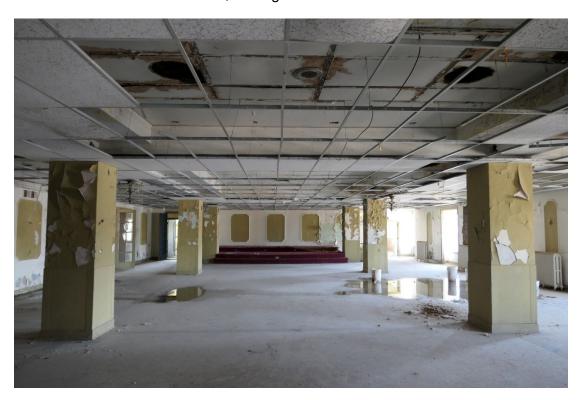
Second floor/mezzanine, former Sample Room, looking north.
